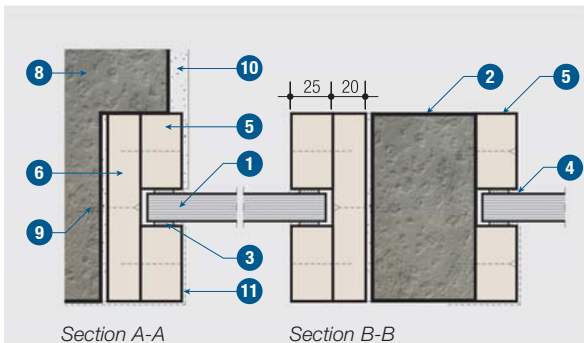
Corner detail >90° to <180° (30 minute rating only)
